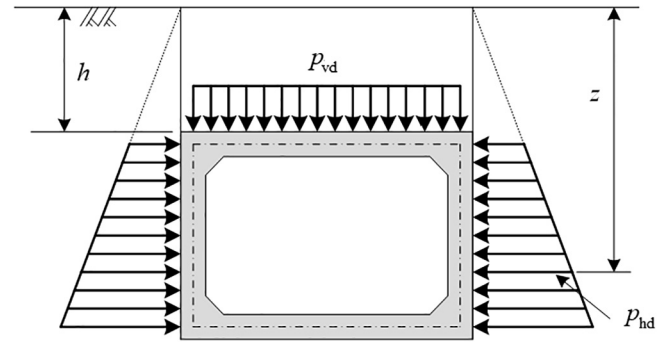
Illustration of load acting on box culvert in Japanese design.
